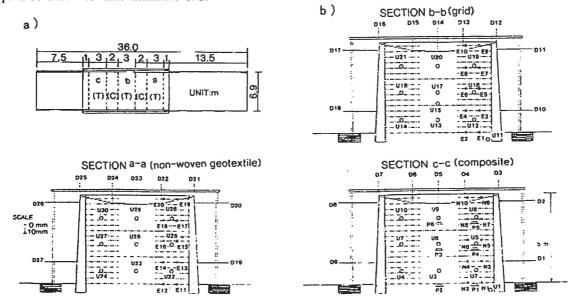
a) Plan; and b) initial cross-sections (gabions at the wall face are not shown), JR test embankment No. 2.
